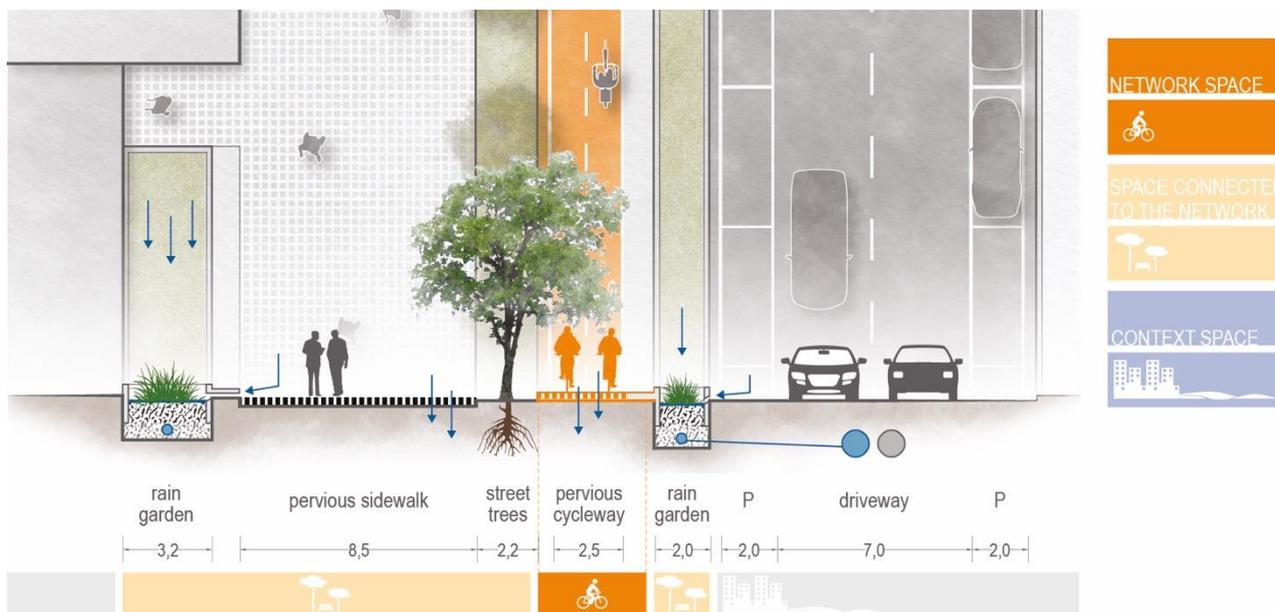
Greater Boston (Cambridge), section and planimetry of Western Avenue. *Original drawing by arch. Angelica Nanni.
